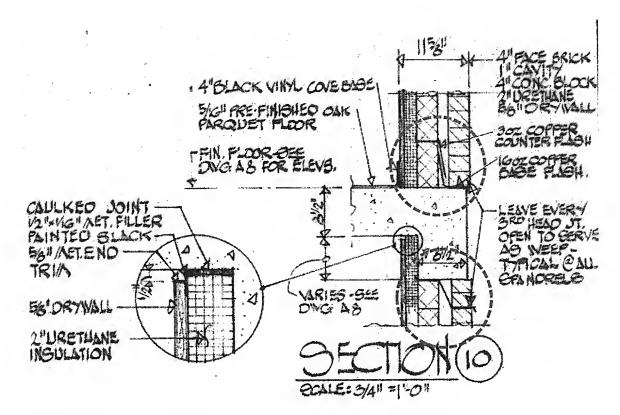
Typical section detail at floor line and concrete perimeter beam soffit from original construction documents, prepared by Robert Charles Associates, Inc., dated December 11, 1967. Note locations of through wall flashings (circled).
